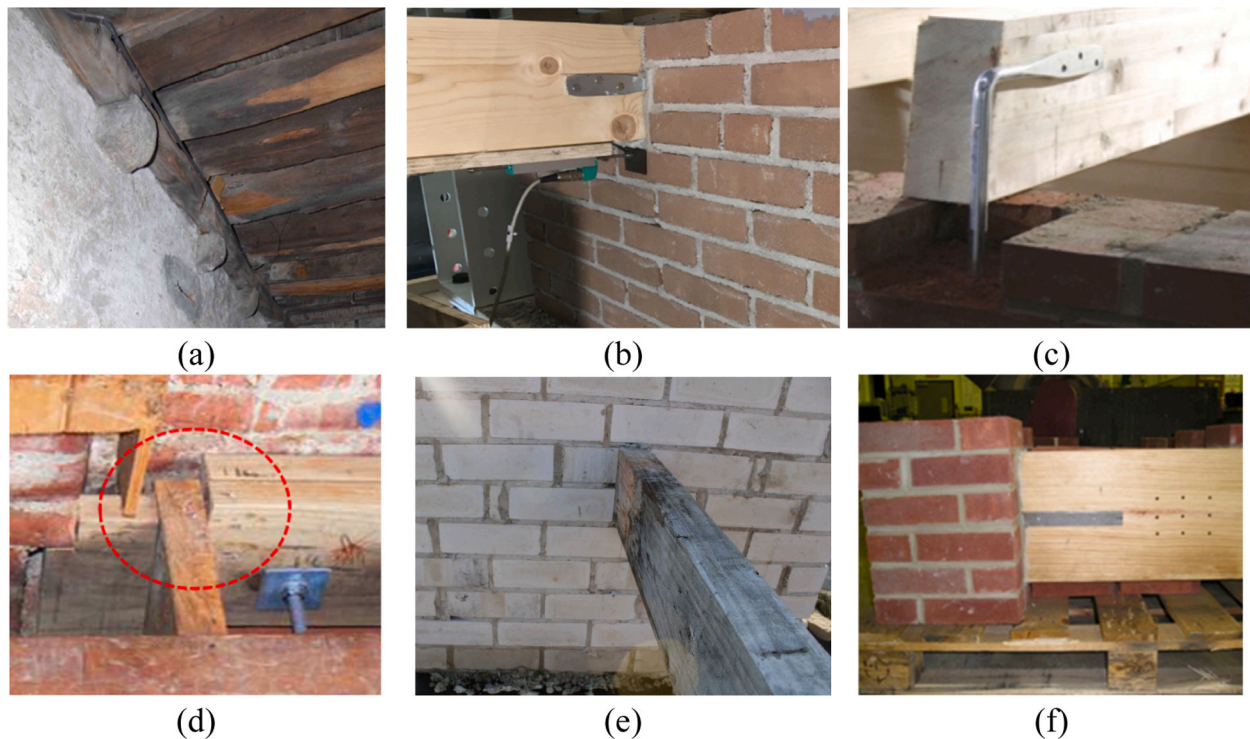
Examples of wall-to-floor connections: timber floor resting on masonry wall [12] (a), timber joist seated in a pocket with hook anchor [20] (b), hook anchor embedded in the masonry wall [11] (c), wall-to-diaphragm connections with timber blocking [18] (d), joist masonry wall connections with cavity wall tie connections [3] (e), and strap anchor connection [13] (f).
